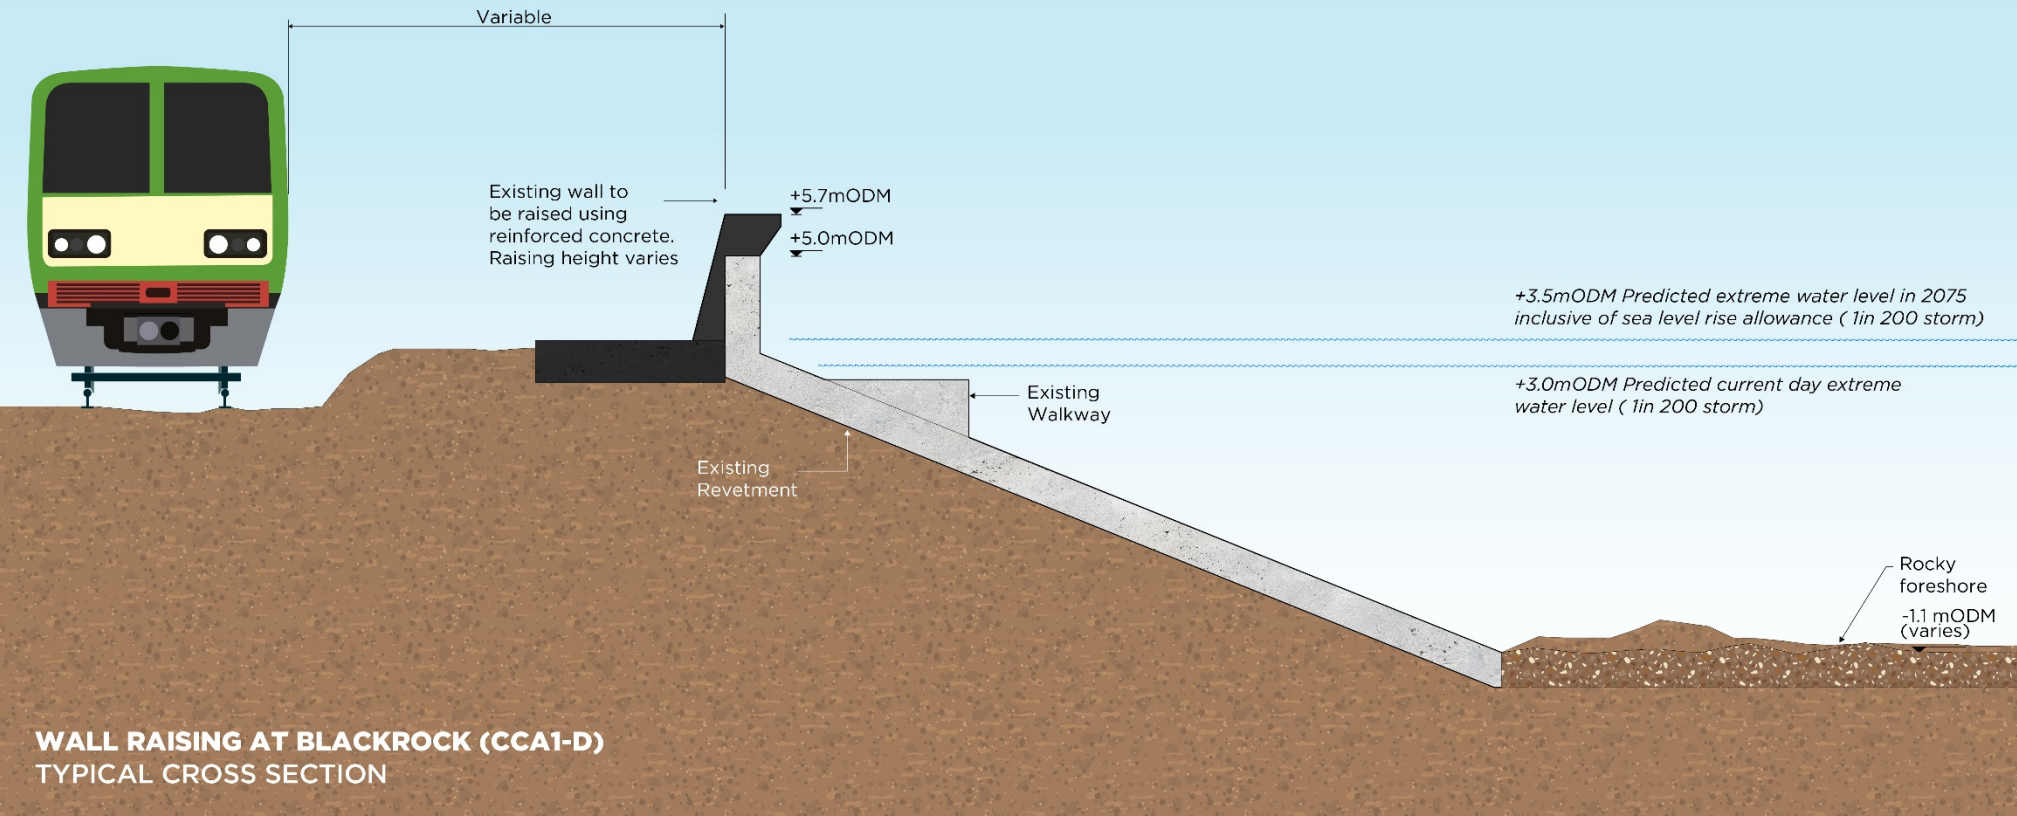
CCA1 Emerging Preferred Scheme Section at Blackrock
